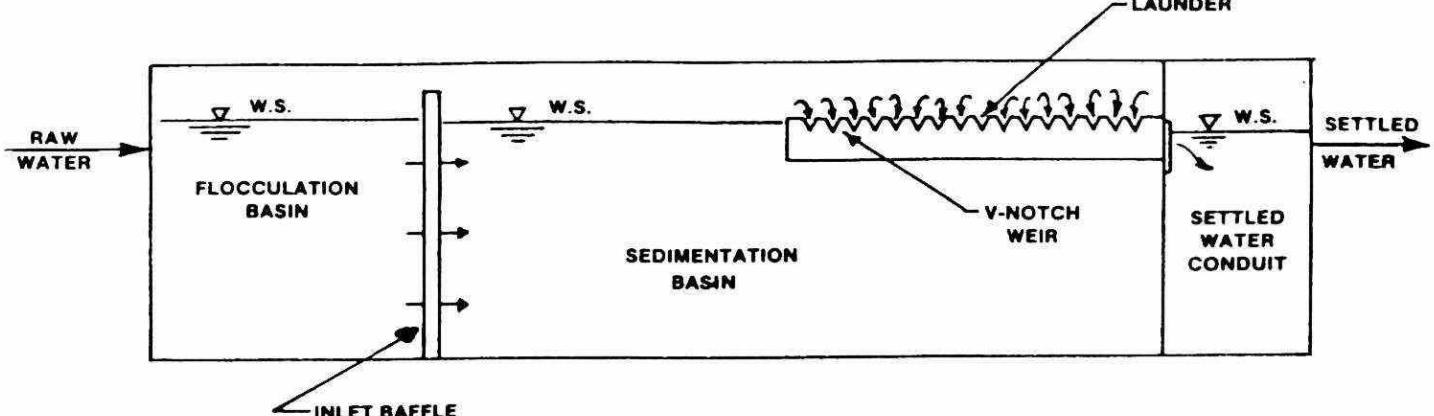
Typical sedimentation basin outlet (flow over V-notch weirs)
